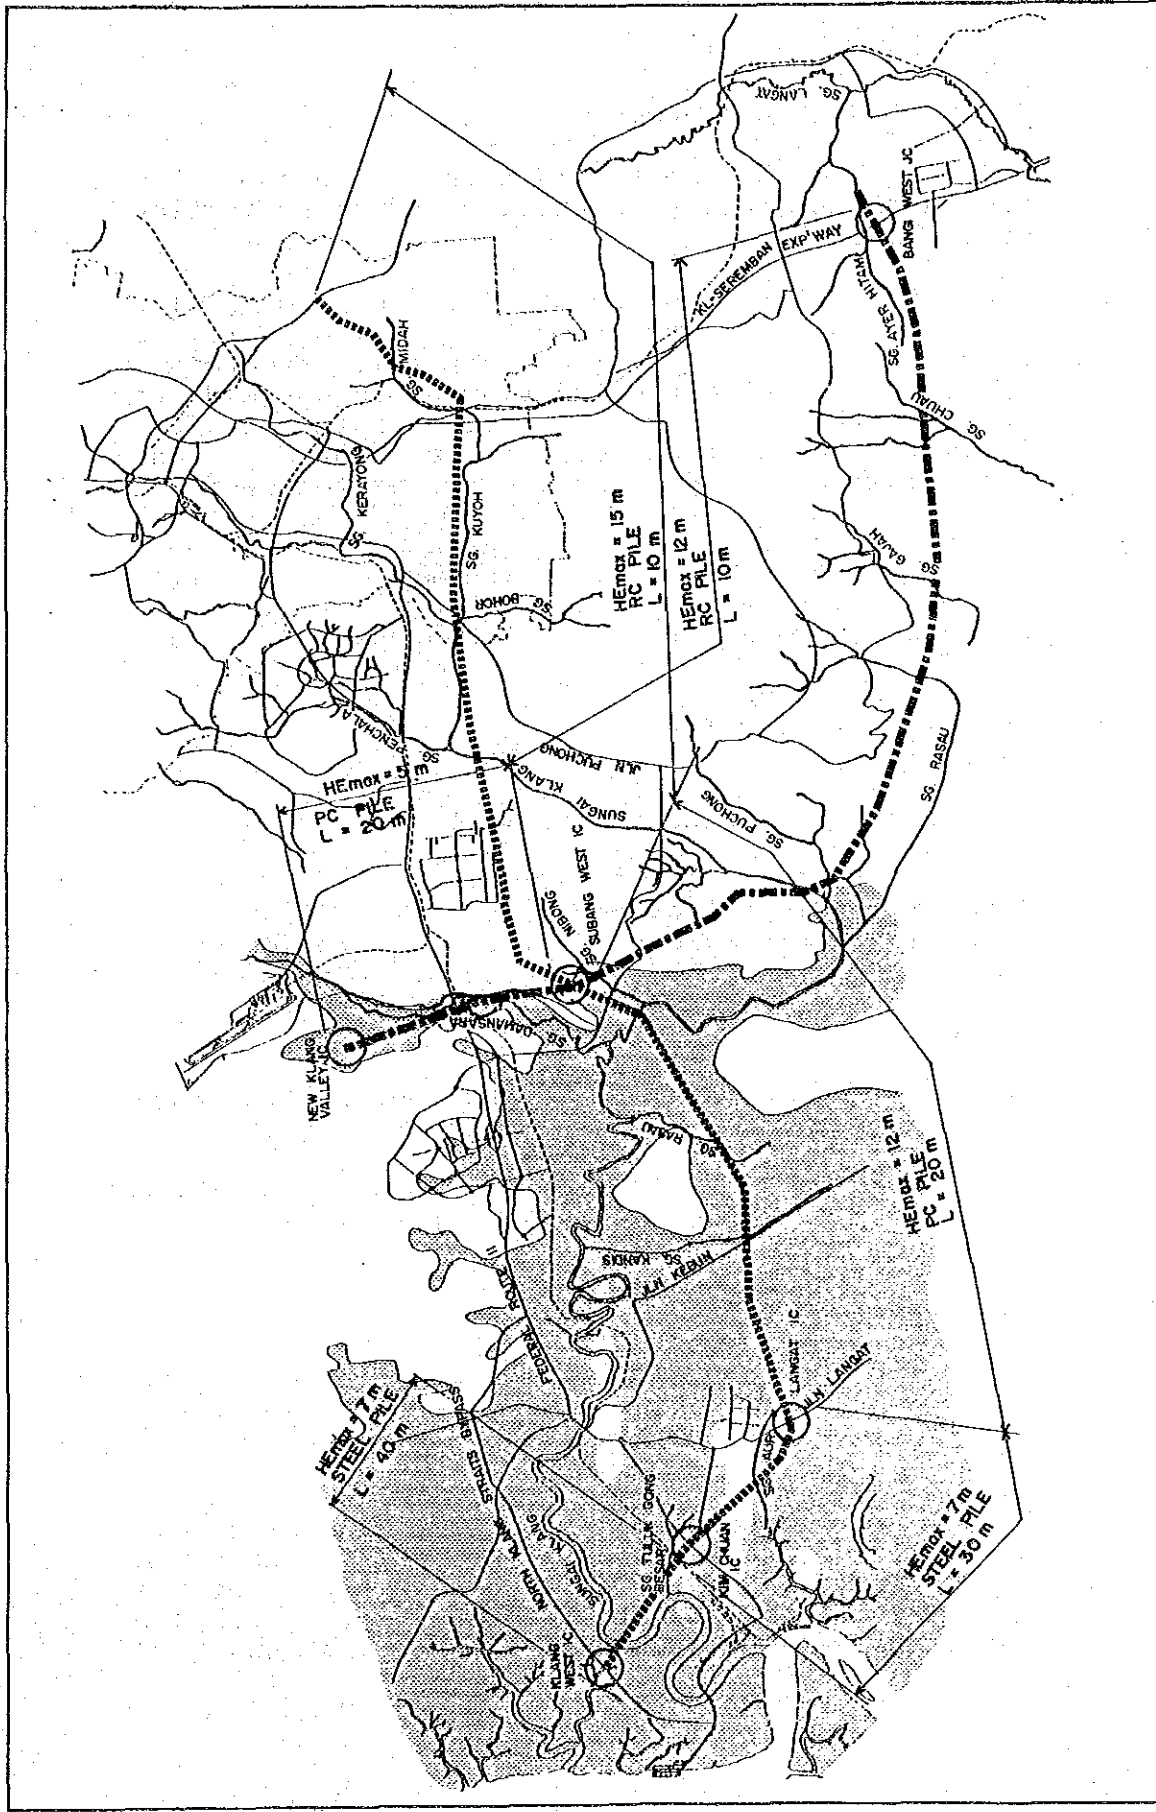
Maximum Embankment Height and Standard Structure Foundation Type
